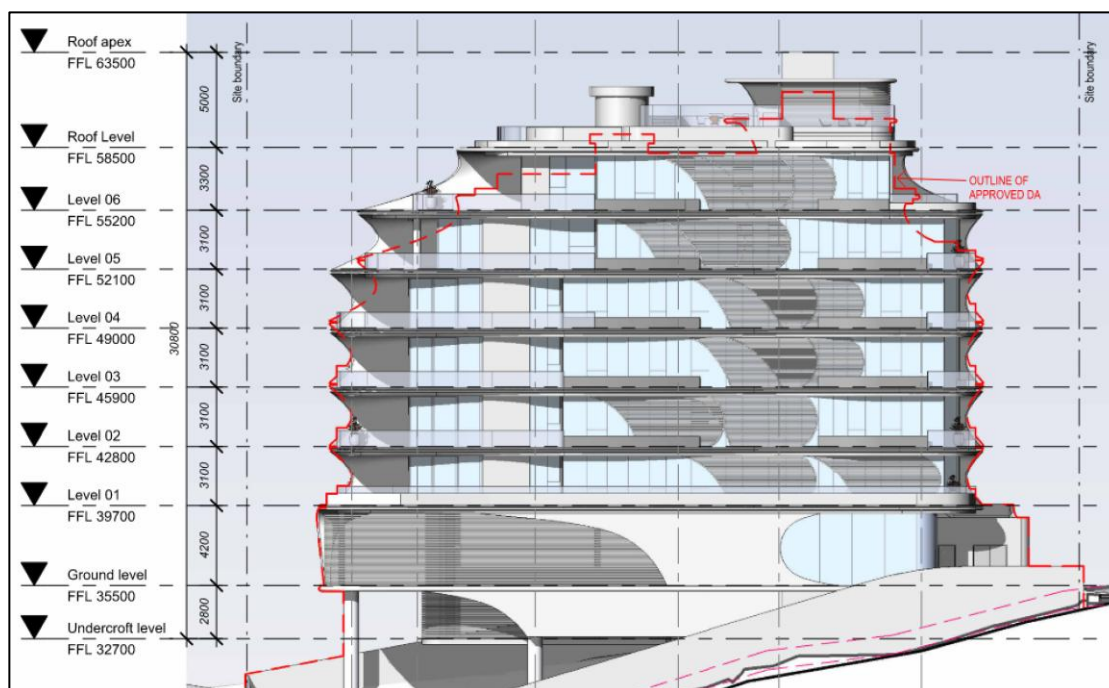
Proposed western section showing outline of approved DA. (Source: Contreras Earl Architecture)
